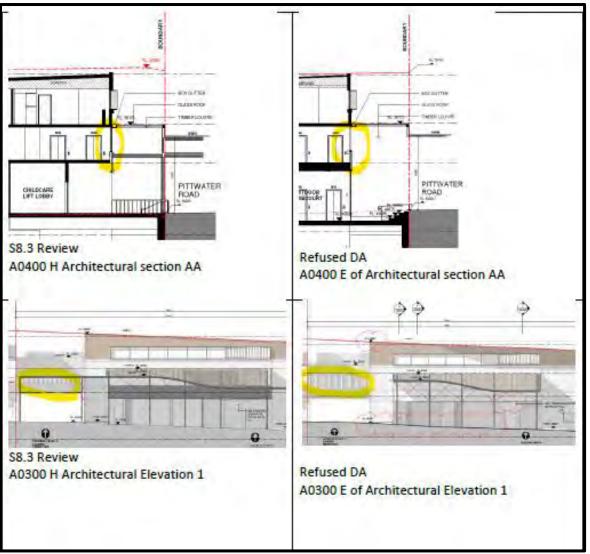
Comparison of the original proposal and revised plans providing a solid wall to the Pittwater Road interface.
